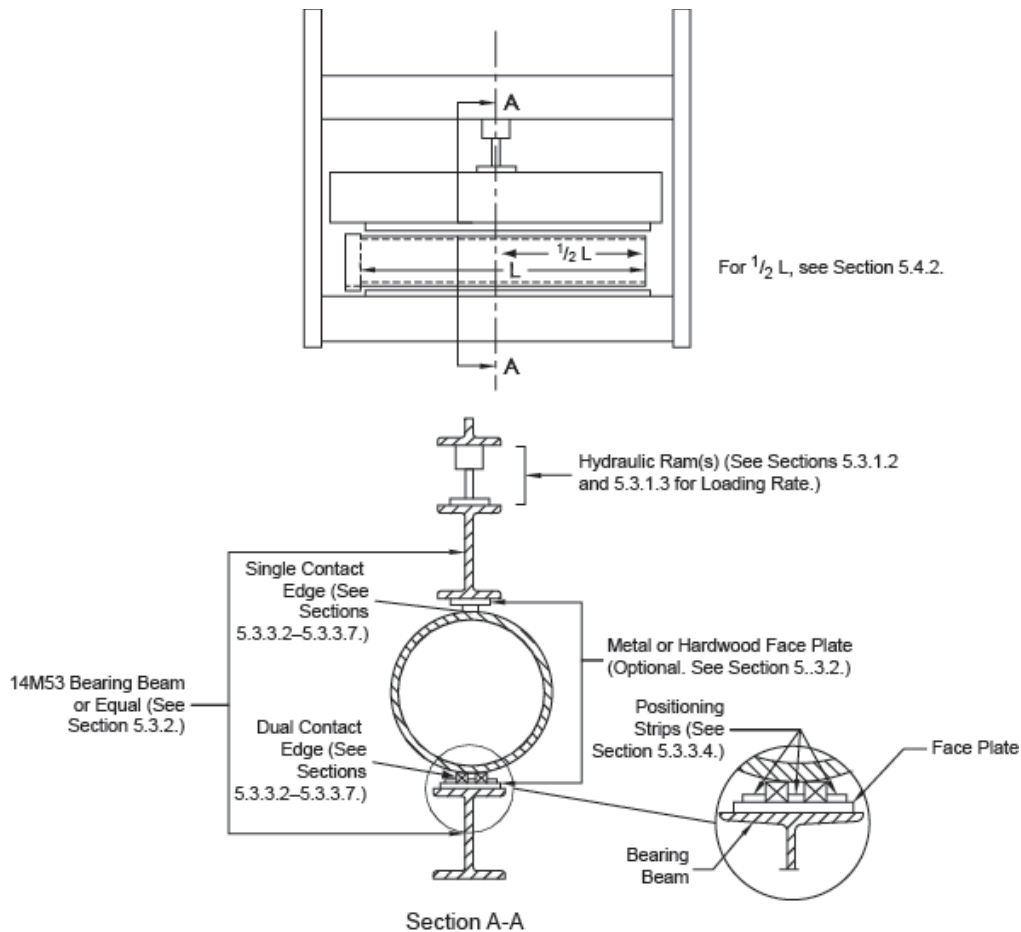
Three-Edge-Bearing Testing (Section 5.3.4 Segmented Testing)
